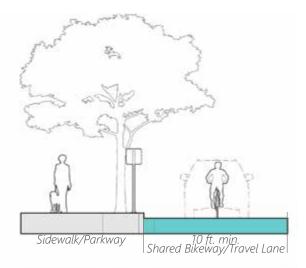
Typical Class III Bikeway, On-Street Parking Adjacent, with Shared-Lane Pavement Marking.
